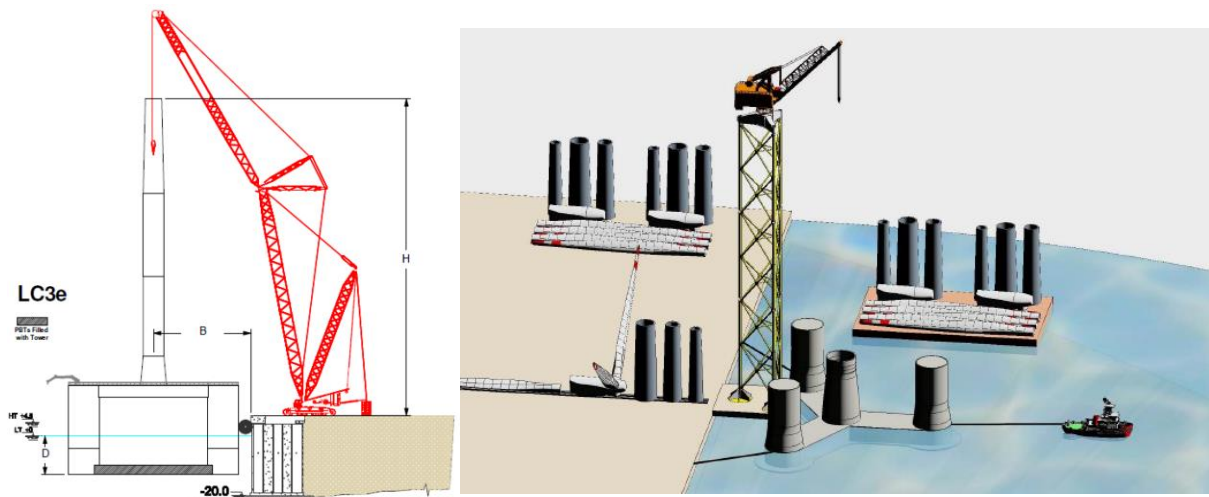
Left: Schematic assembly of wind turbine tower [NAUTILUS Floating Solutions]; Right: Illustration of exemplary wind turbine assembly at quay side [Dr. Techn. Olav Olsen].
